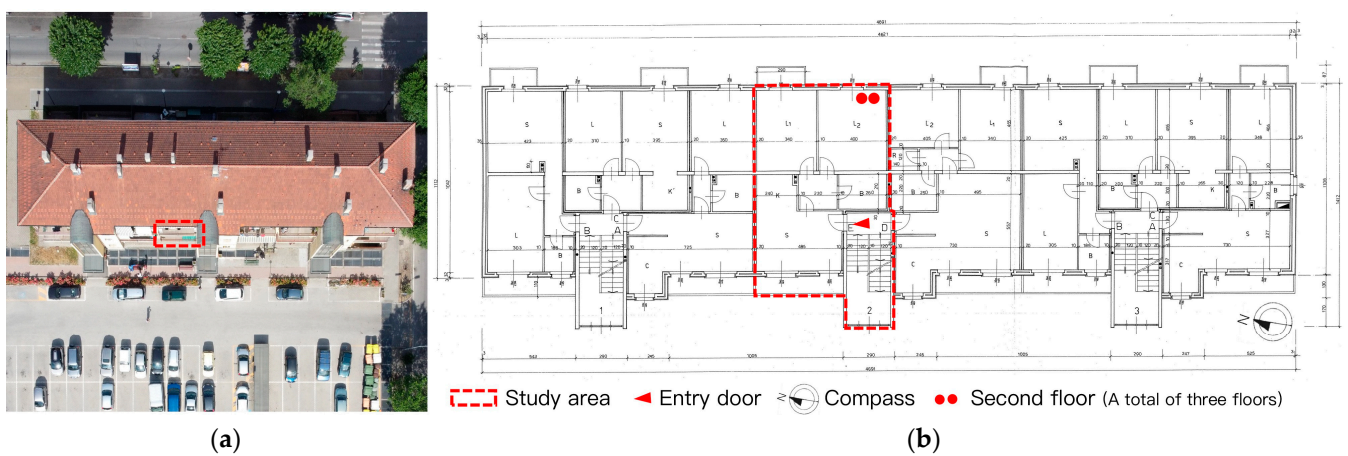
Aosta Social Housing: (a) Gazzera building top view; (b) Building second-floor plan.
